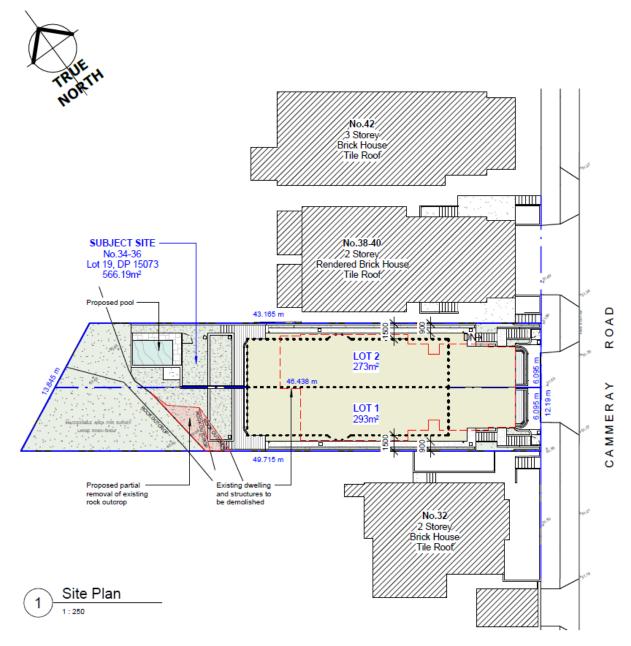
The line of subdivision is demarcated by the common wall which separates the dwellings.
